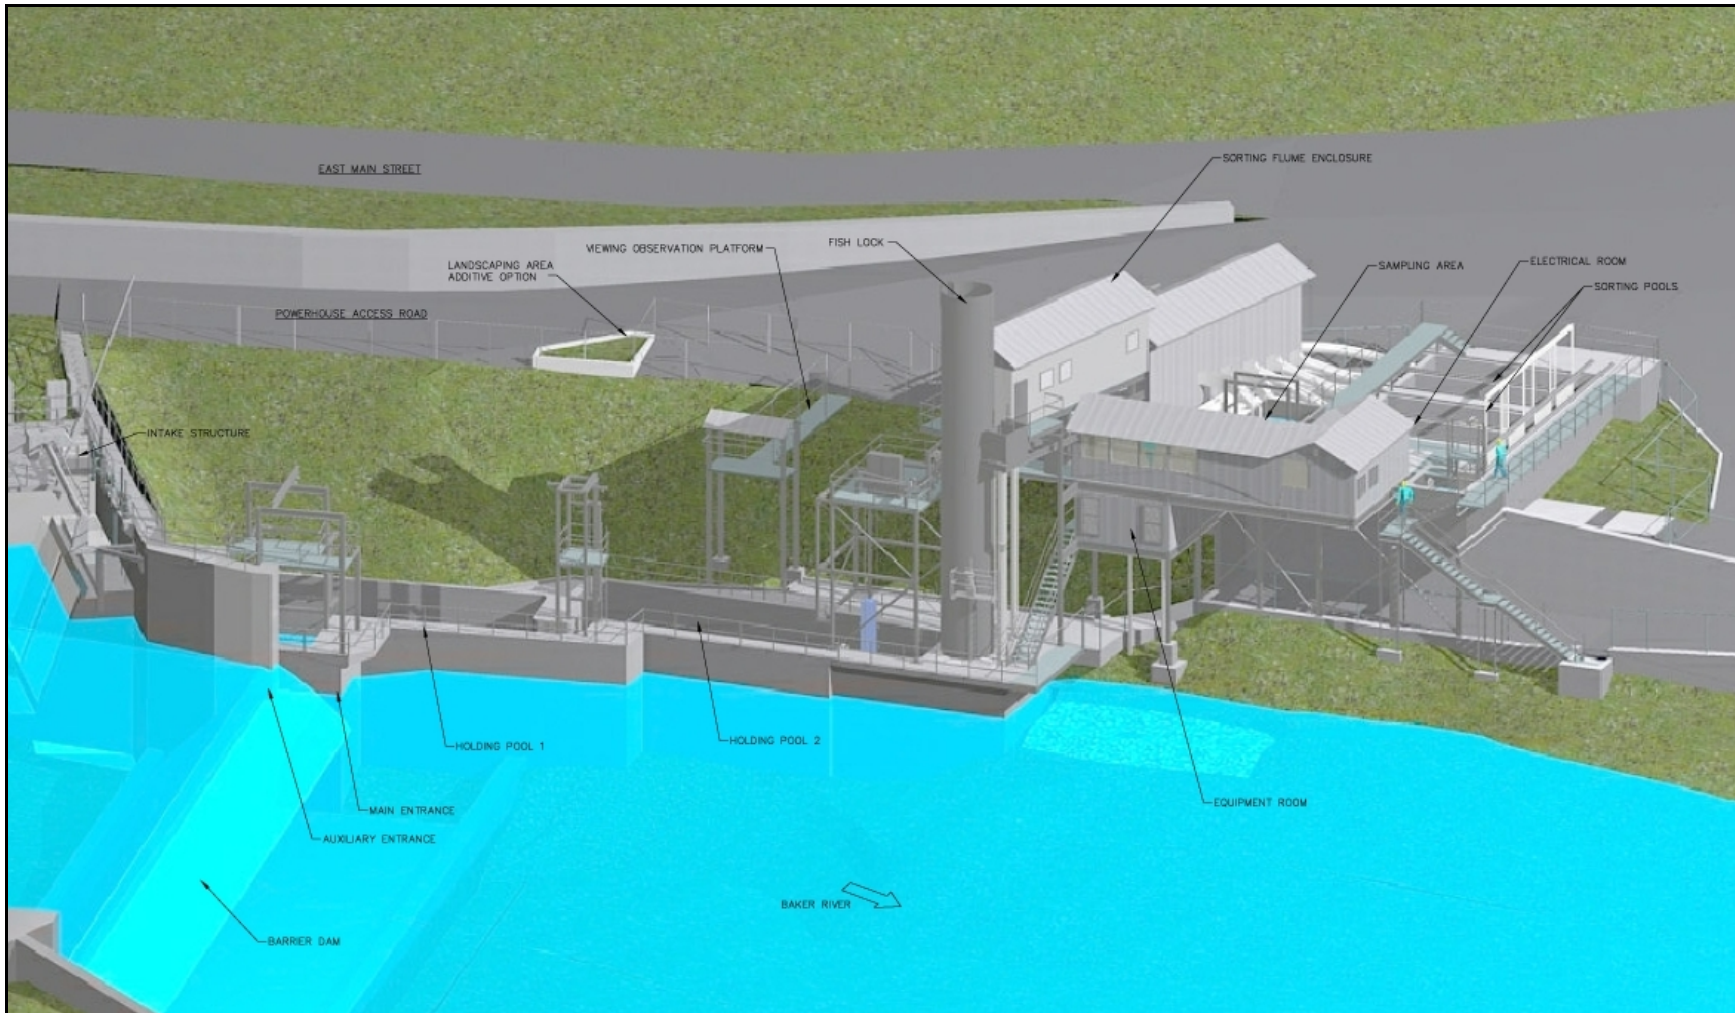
Site rendering of Baker River AFT, Concrete, Washington.
